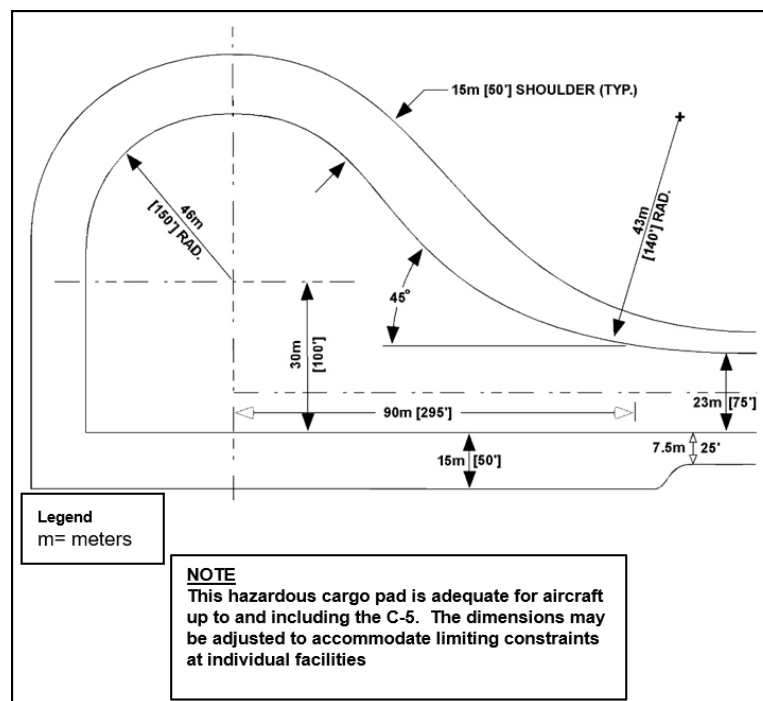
Sample of a semi-circular pad for large cargo aircraft
